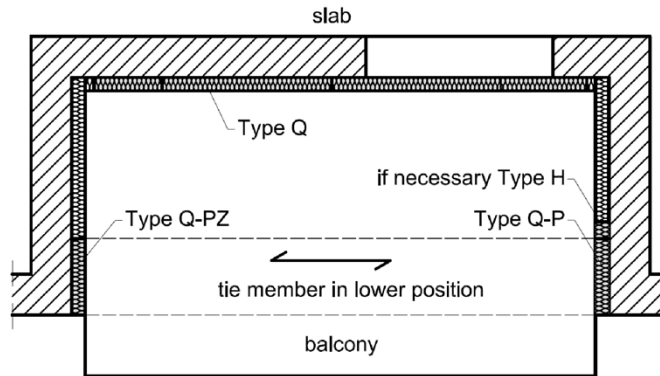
Constraint-free application: Example Schöck Isokorb® Type Q-Z, Q-PZ (without compression elements) with opposing slab connections Schöck Isokorb® Type Q, Q-P (if necessary with Type H)
